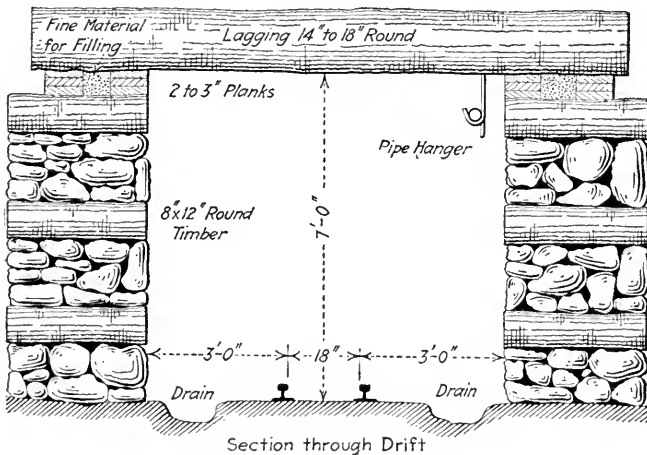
DRYWALL AND TIMBER FOR DRIFT.
